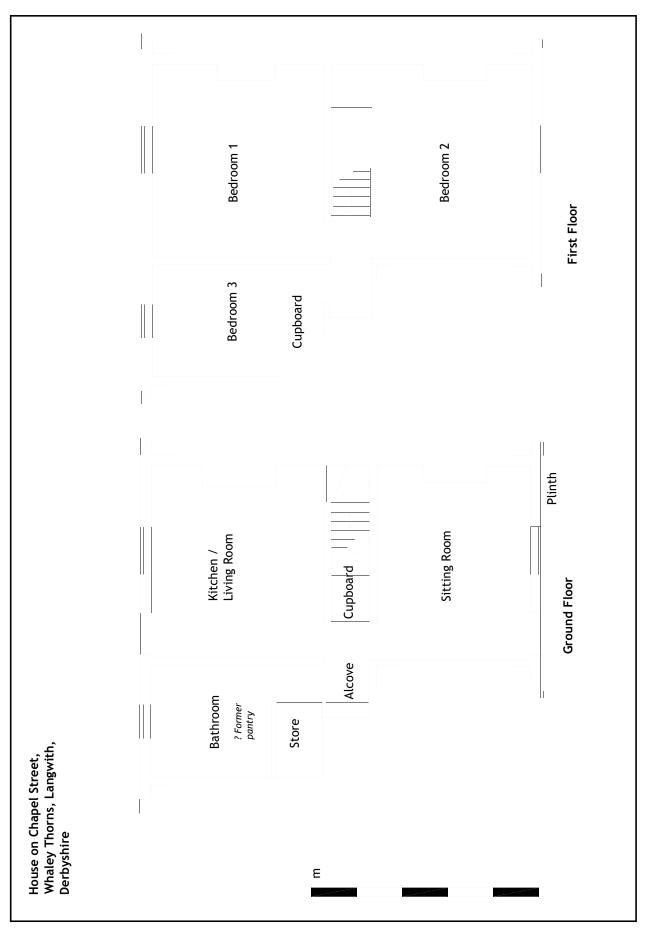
Floor plans of a house on Chapel Street, Whaley Thorns. Not to scale.
